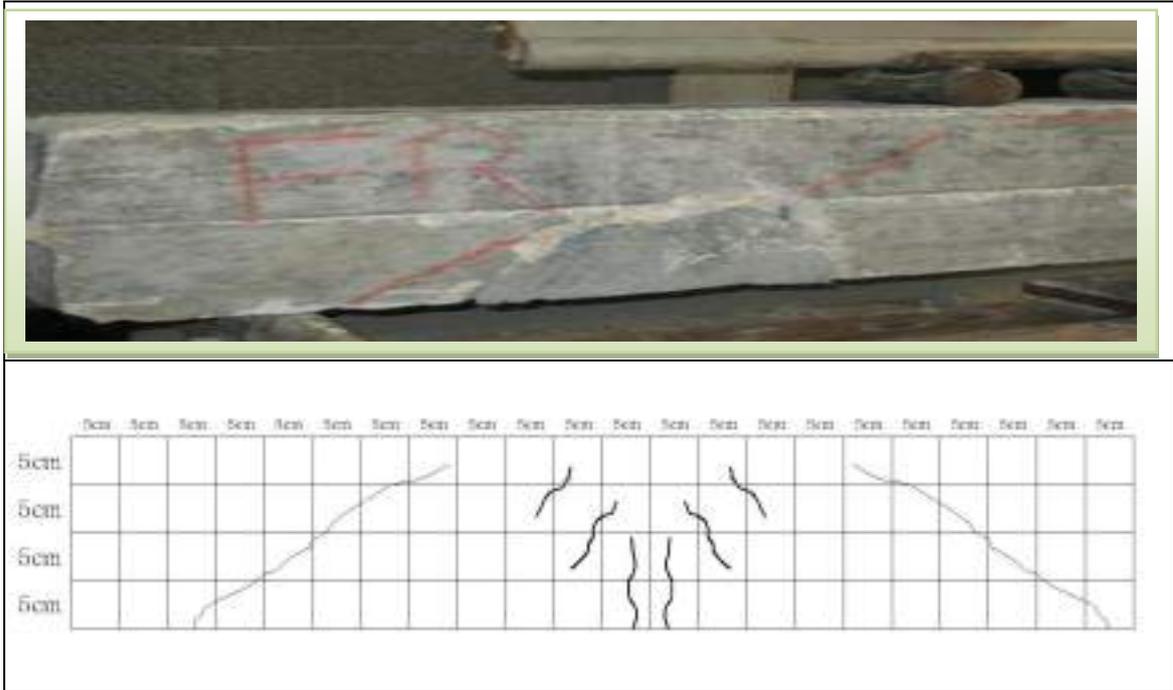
Cracking pattern of cracked beams repaired by UHPFRC
